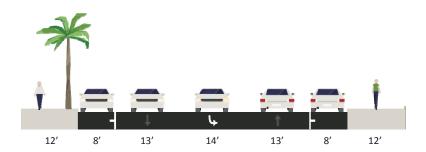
Madison Street Typical Cross-Section, between Florida Avenue and Marion Street
